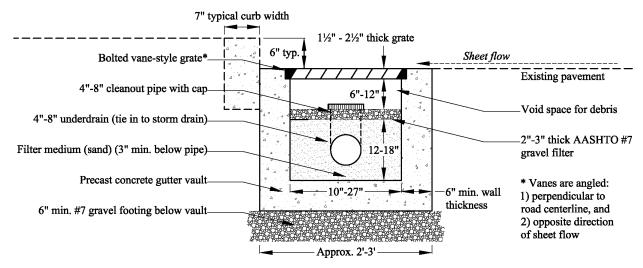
Typical gutter filter cross-section. Not to scale. Rebar not shown for clarity.
